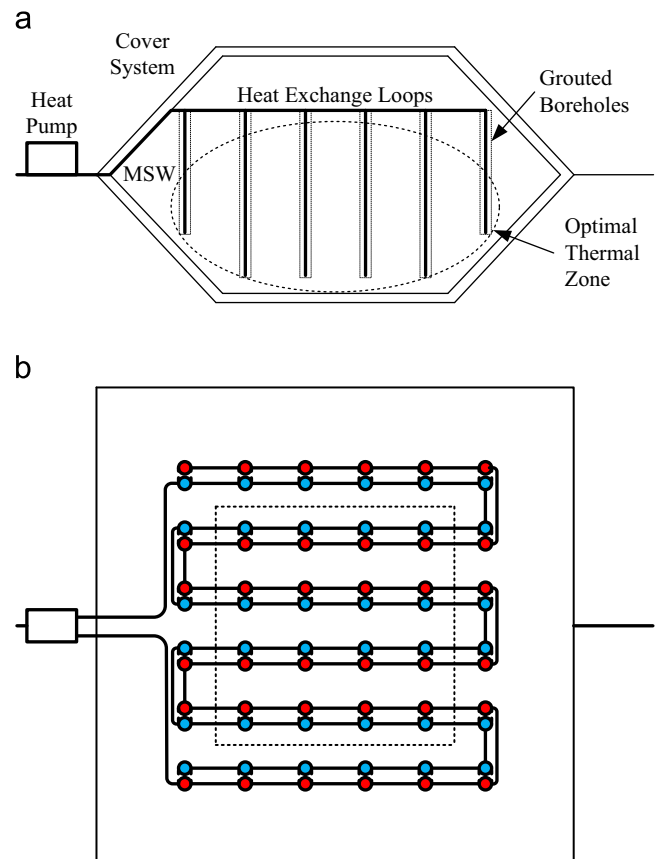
Vertical geothermal heat exchanger configuration for new landfills: (a) Elevation section of vertical configuration; (b) Plan view of vertical configuration.
